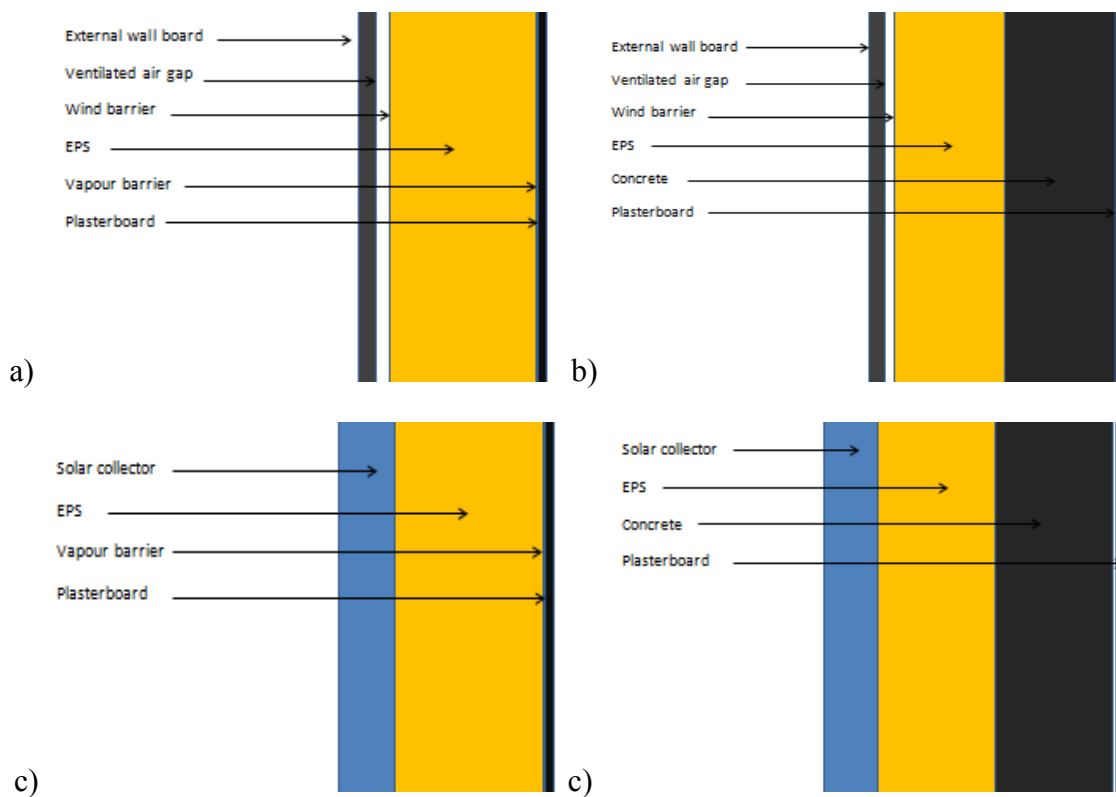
Conventional walls: a) Wall A b) Wall B, Solar walls: c) Wall C d) Wall D
